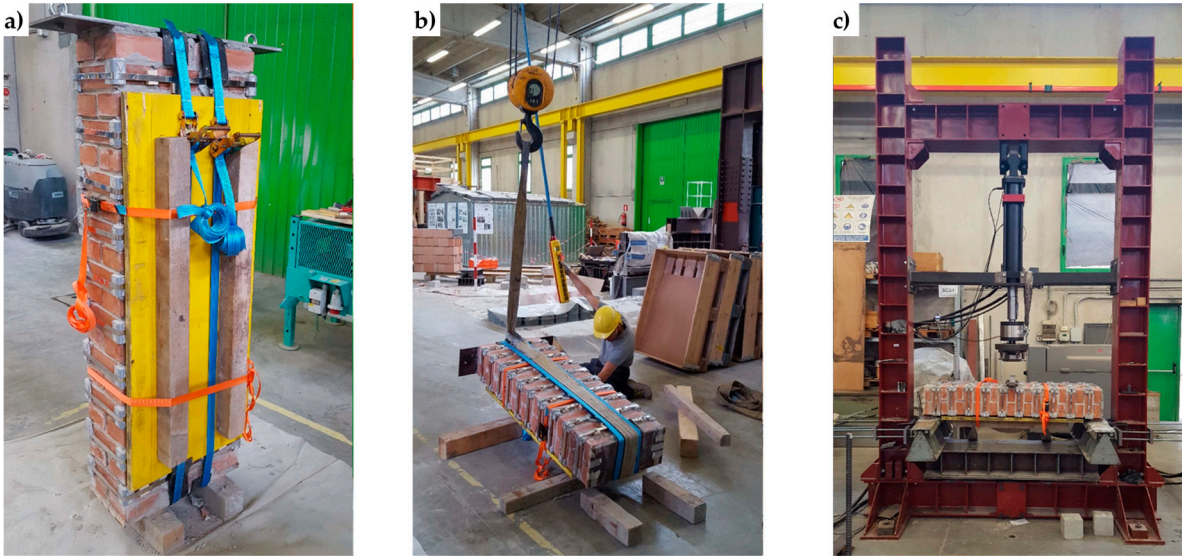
Specimen handling: a) harness; b) overturning; c) positioning on the testing machine.
